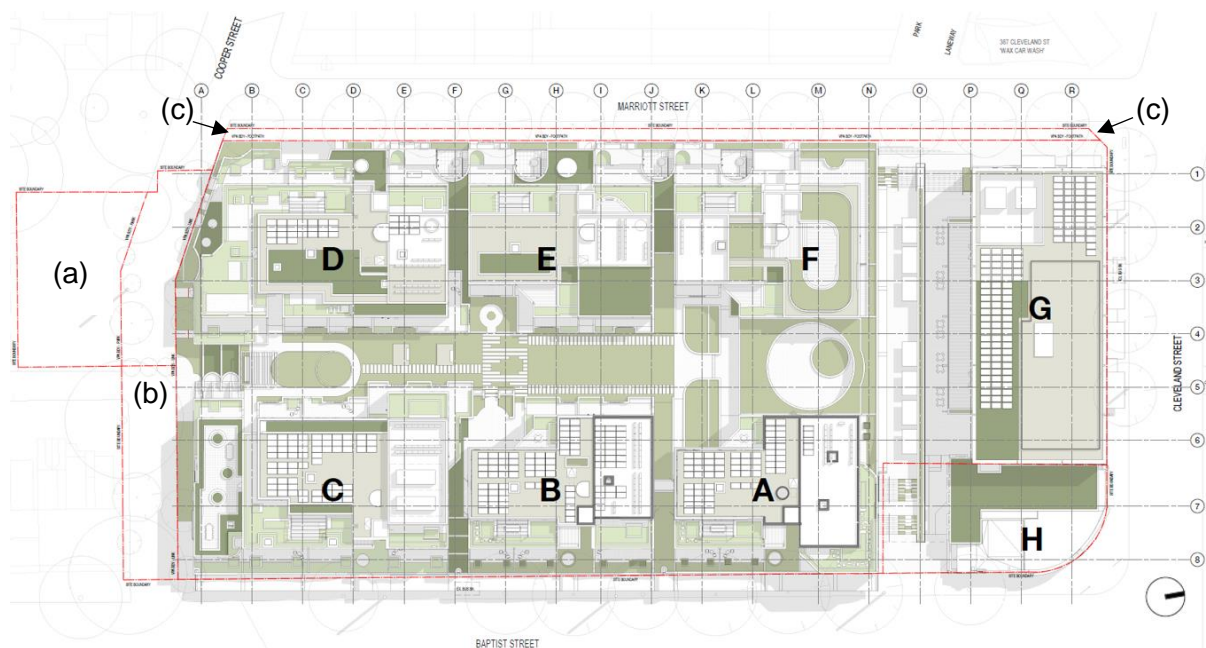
Site plan of the proposed development, with transferred land indicated as (a), (b) and (c).
